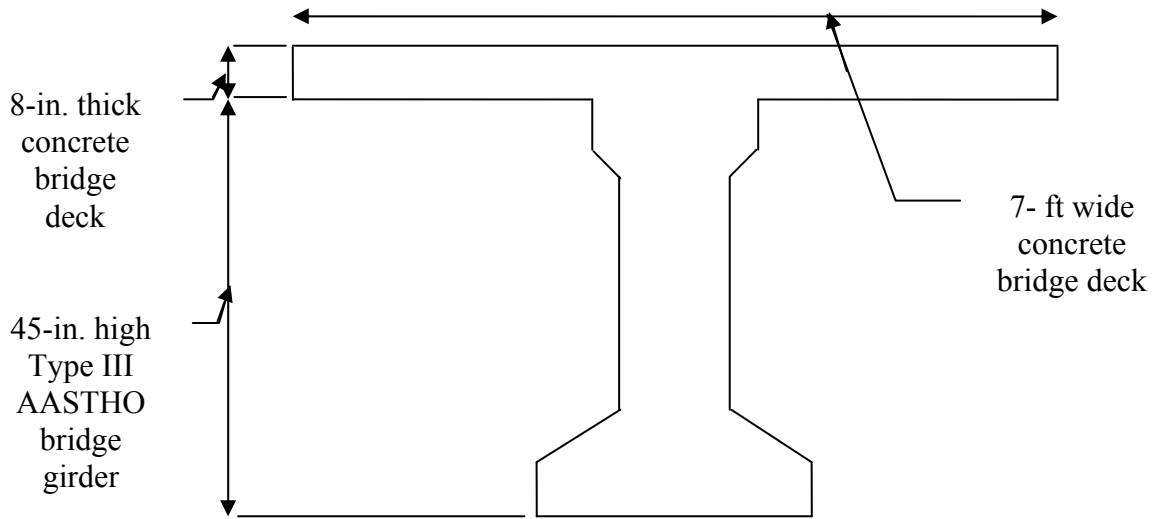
Section view of composite section used in beam theory calculations
